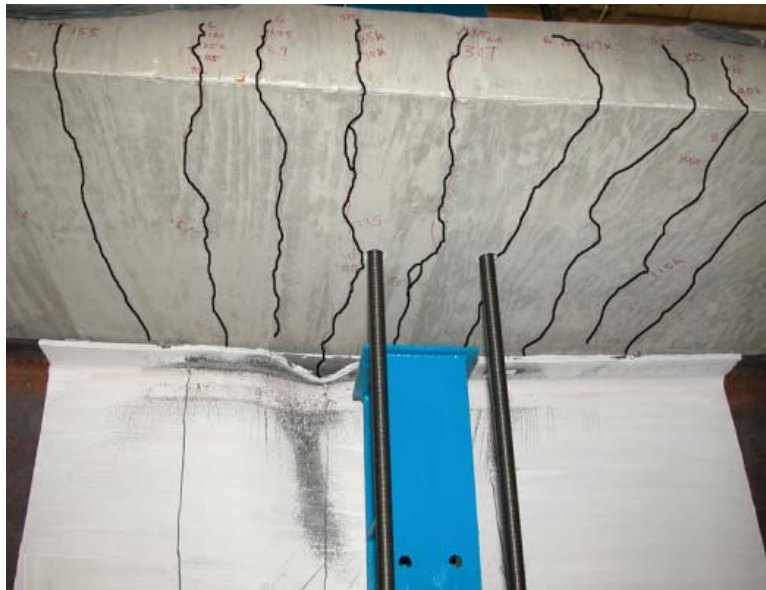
Specimen NON-00BS - Cracks in the slab and beam local buckling (11-in. deflection)
